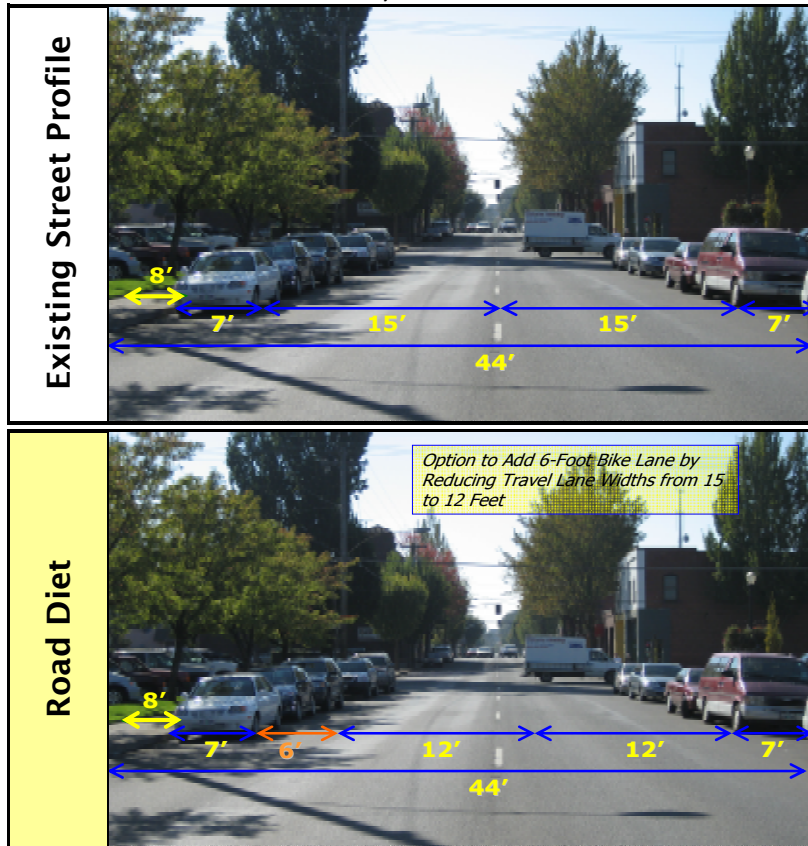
illustrates another Road Diet application, in this example on Highway 99W (Baker Street) within the one-way couplet section. By reducing travel lanes from 15 to 12 feet, a new 6-foot bike lane can be added.
